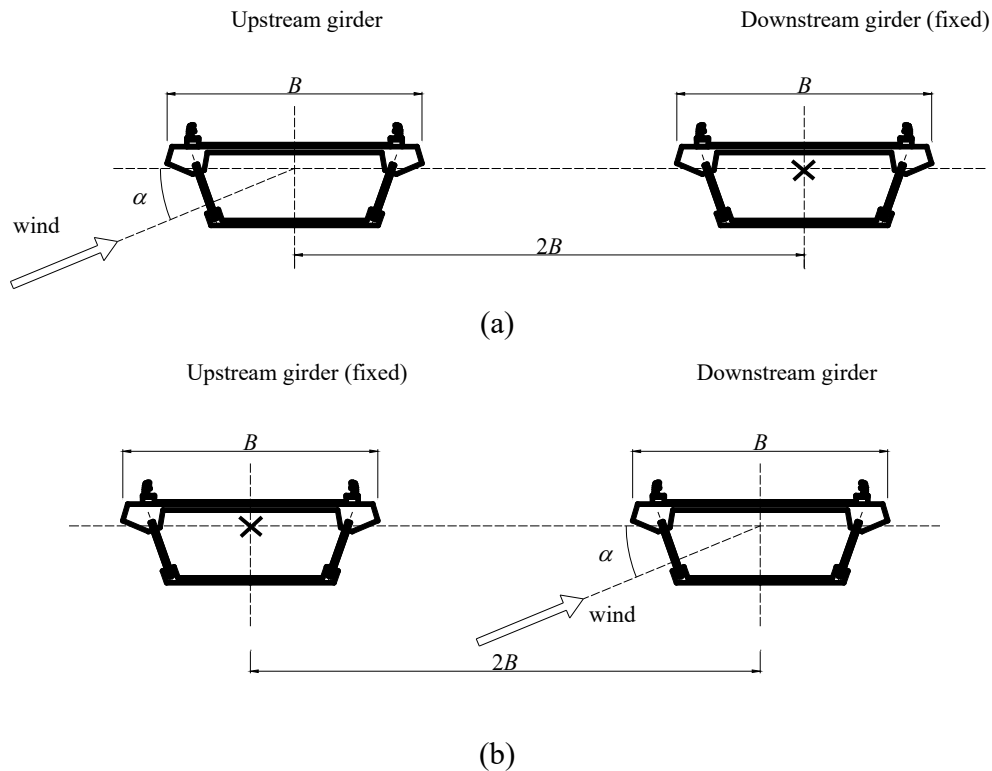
Disposition of two girders in the wind tunnel: (a) the upstream girder is under measurement with a fixed girder at the downstream side; (b) the downstream girder is under measurement with a fixed girder at the upstream side.
